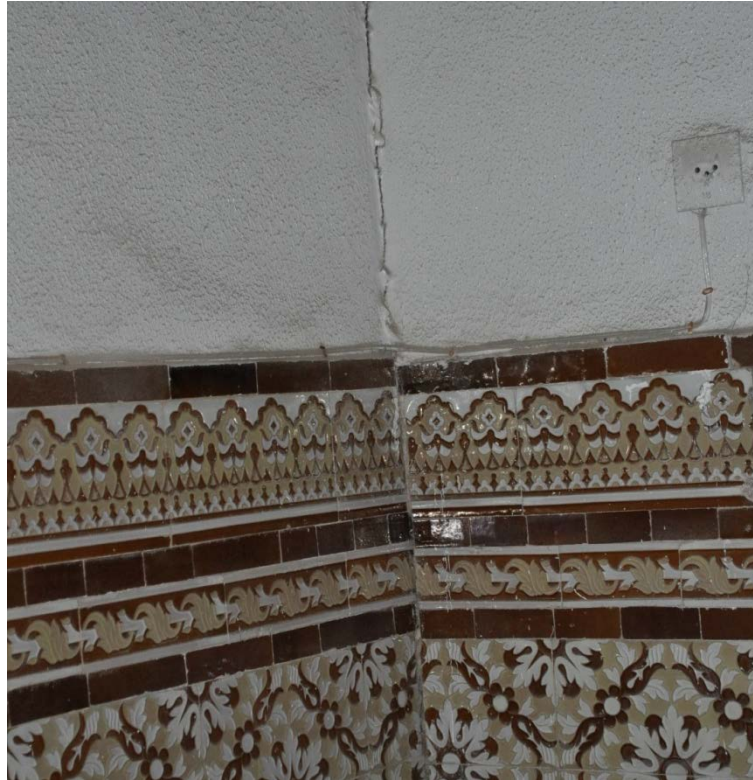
Offset between tiled baseboards and cracks in the ground floor walls.
